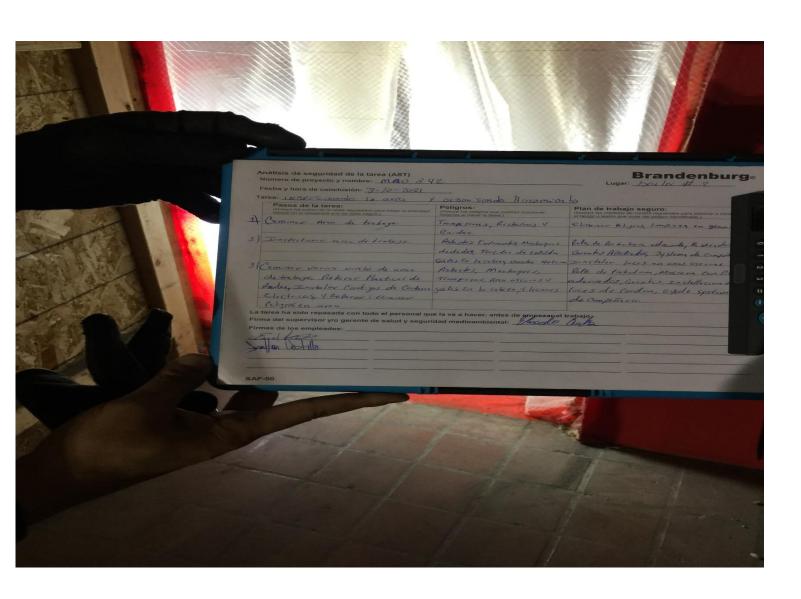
Spanish Language TSA's at worksite reviewed for completeness
